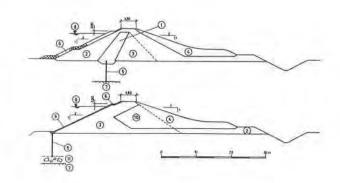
Power station Altenwoerth Cross sections of cofferdams
